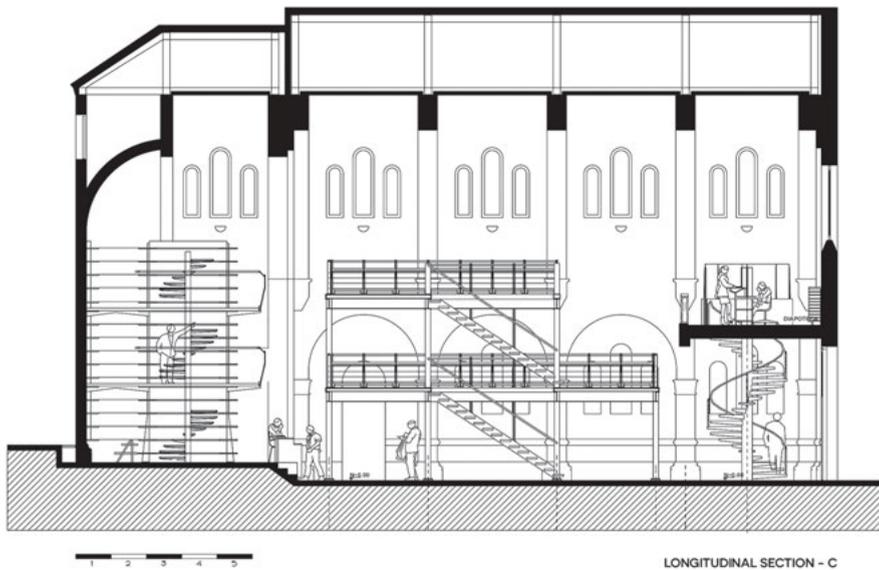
La Capilla, longitudinal section. © Carlos Campuzano Arquitectos.
